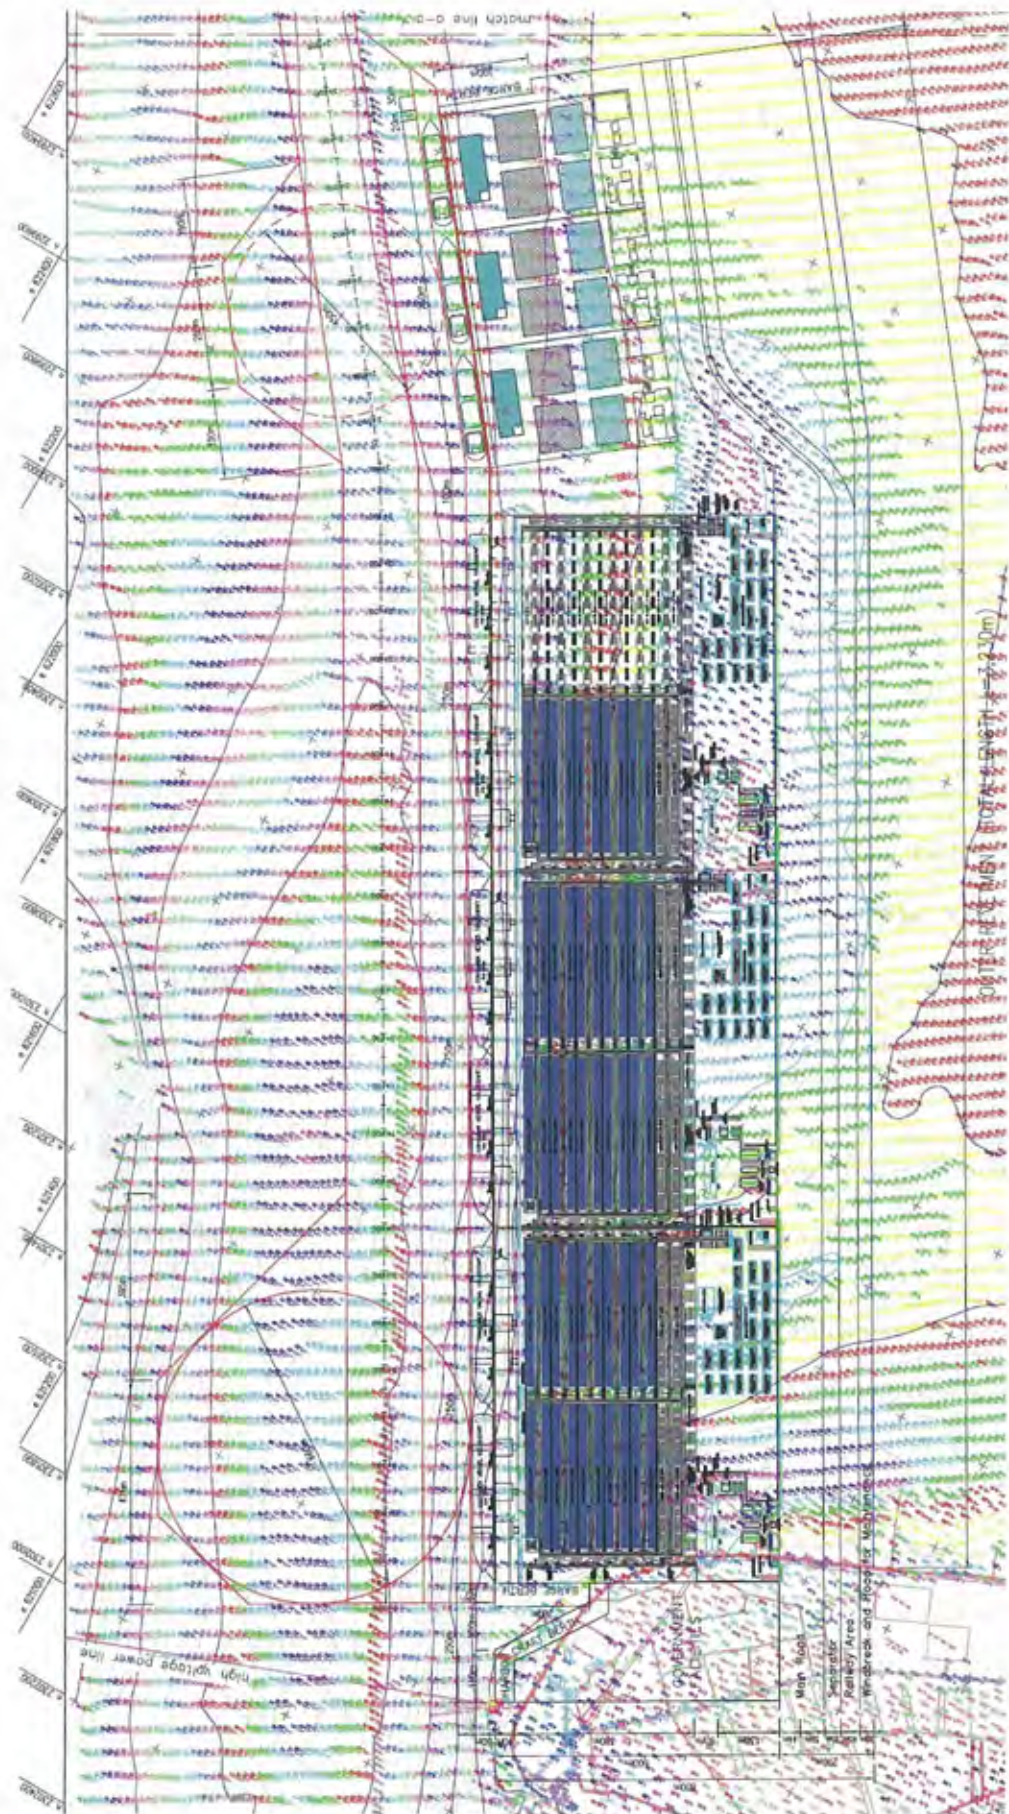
General Layout Plan of Terminal Facilities (Alternative 1: Barge Berth Basin is arranged)
